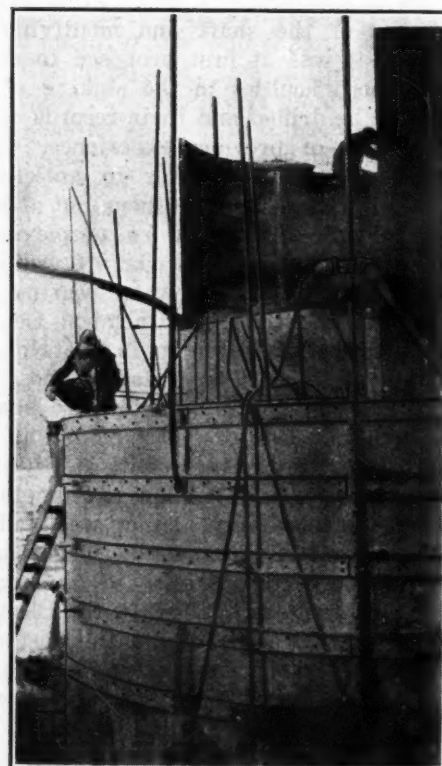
BLOWING DRY SAND FROM AUXILIARY SHAFT
